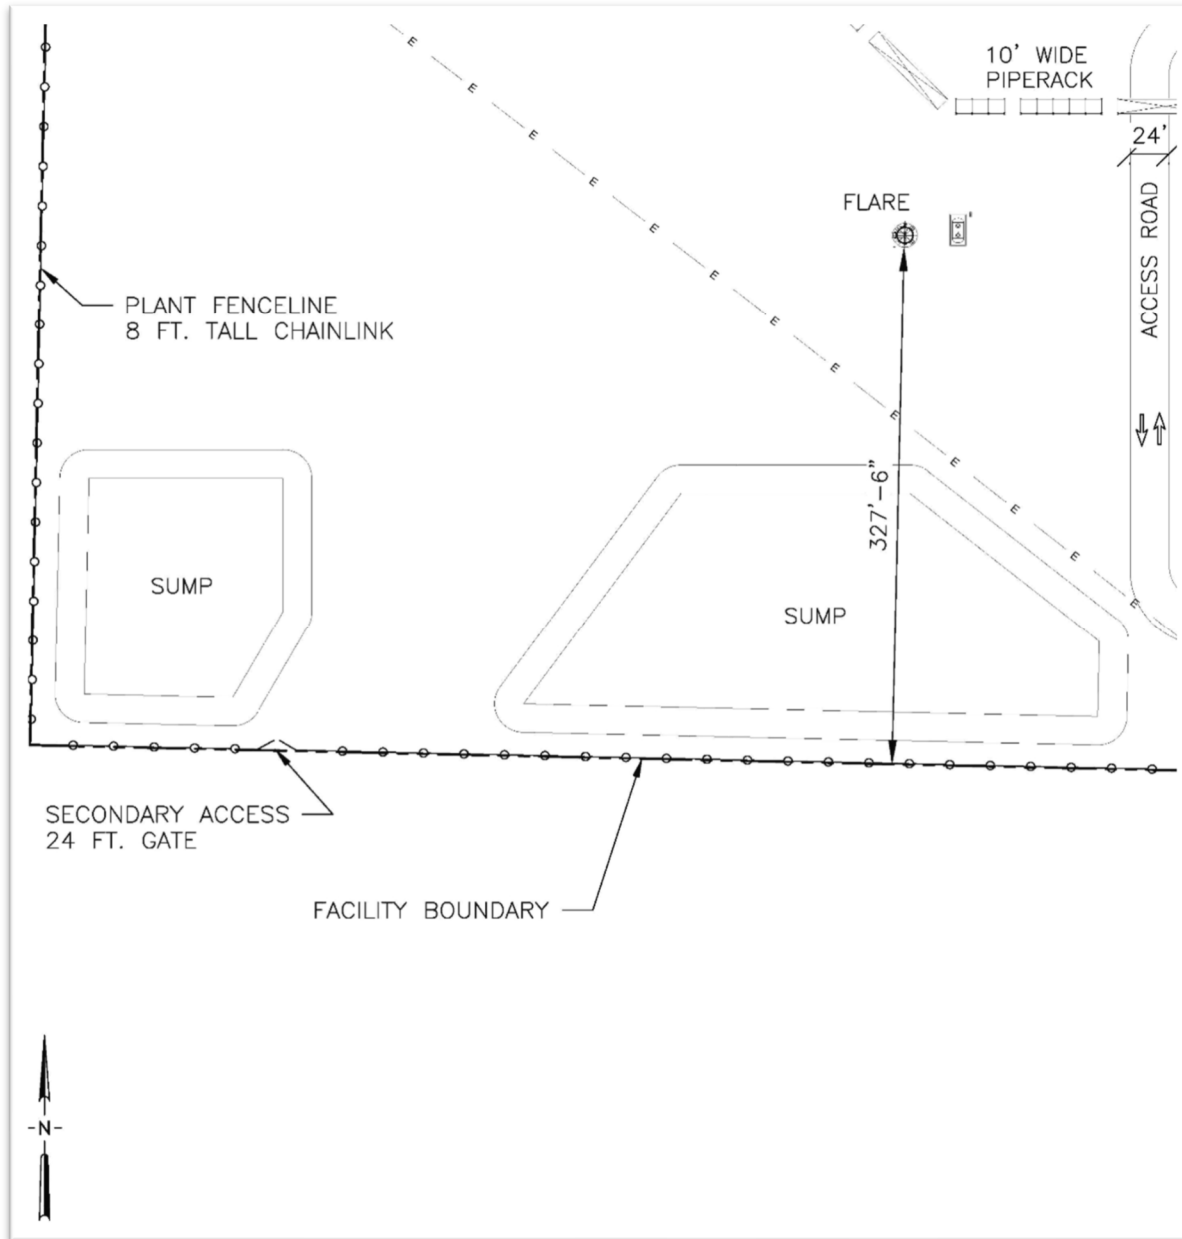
Proposed PD Plan – Enlarged Southwest Site Plan
